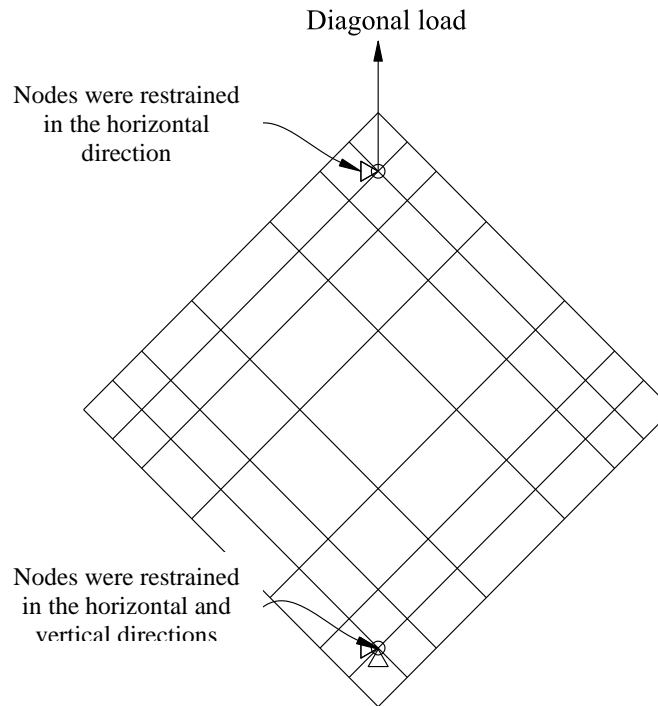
Boundary condition details for wall units tested under pure in-plane shear
